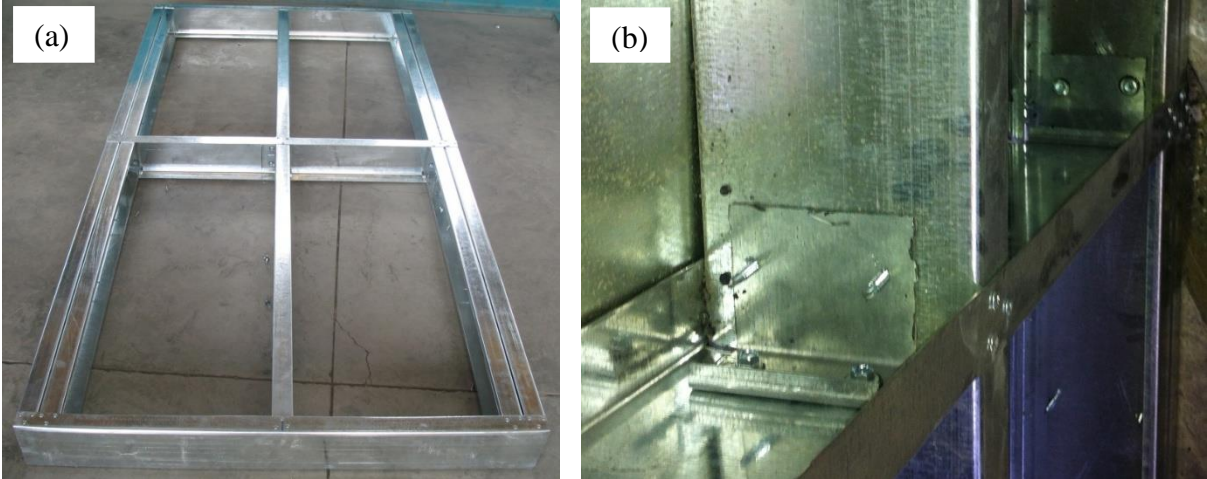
Blocking details: (a) Frame prior to installation of sheathing, (b) Blocking connection to interior stud and chord stud
